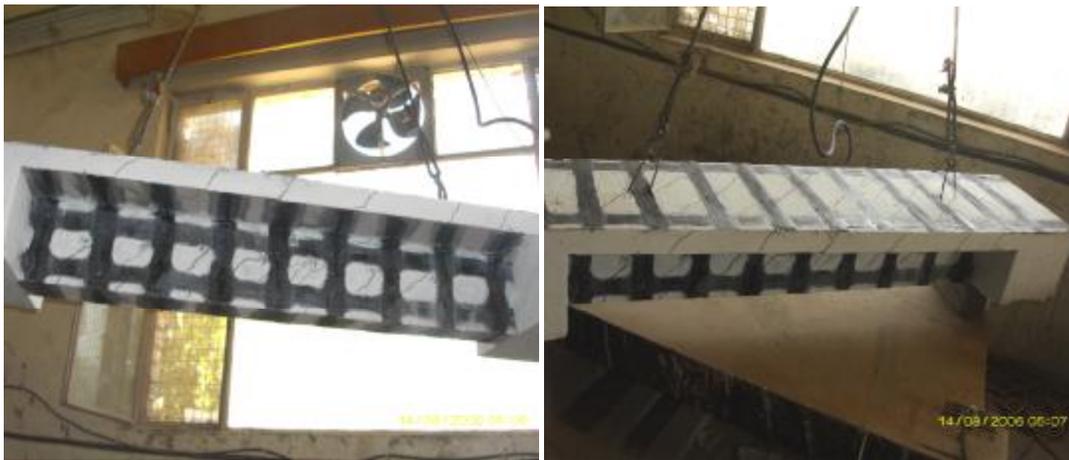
Mode of Failure of Strengthened Beam B690WFL (90° Strips + Long. Strips)
